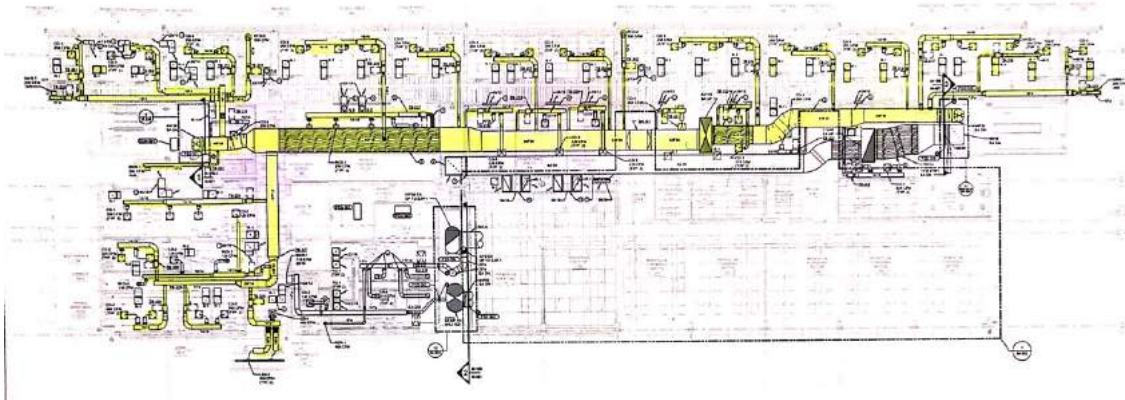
AHU3 system – Third floor (Source: Architectural plans)
